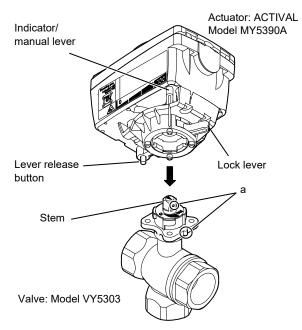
Mounting Model MY5390A actuator on Model VY5303 valve
